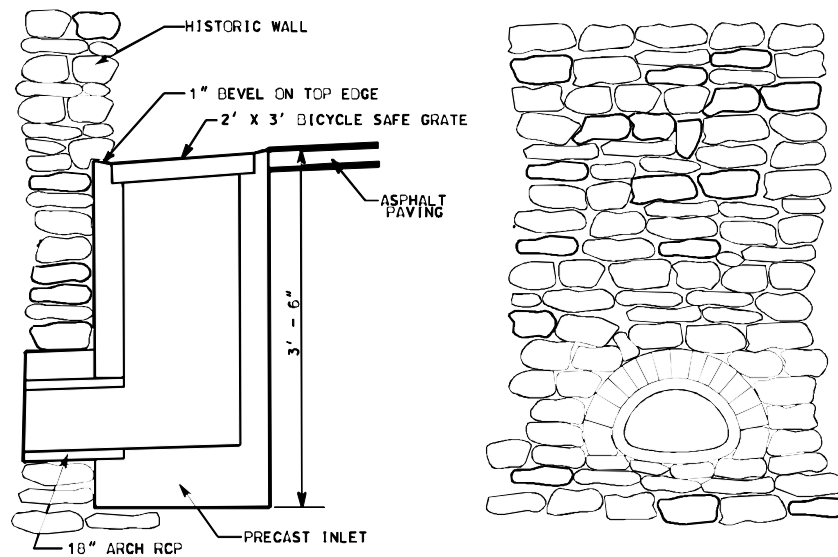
Installation of a drainage inlet on the roadway next to a stone masonry wall
